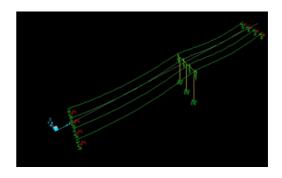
PRE STRESSED LOADS OF BRIDGE STRUCTURE
